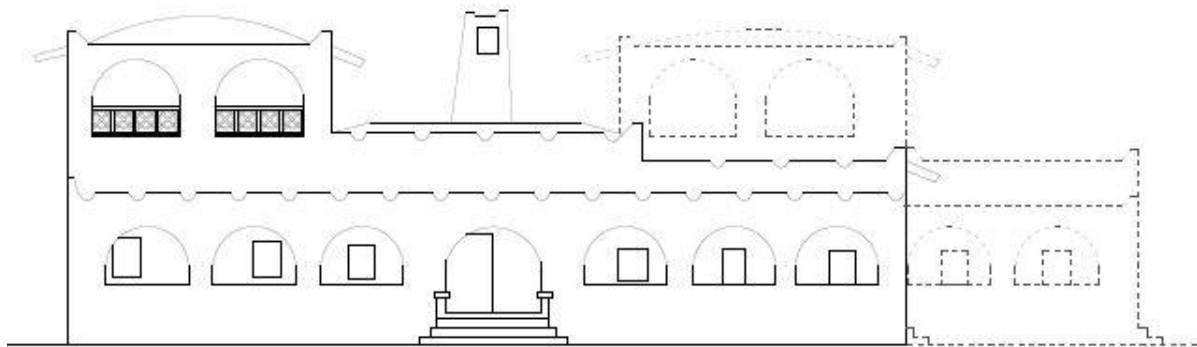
1929 drawing of European quarters adapted to the Hausa house form, Katsina (elevation)<sup>393</sup>
